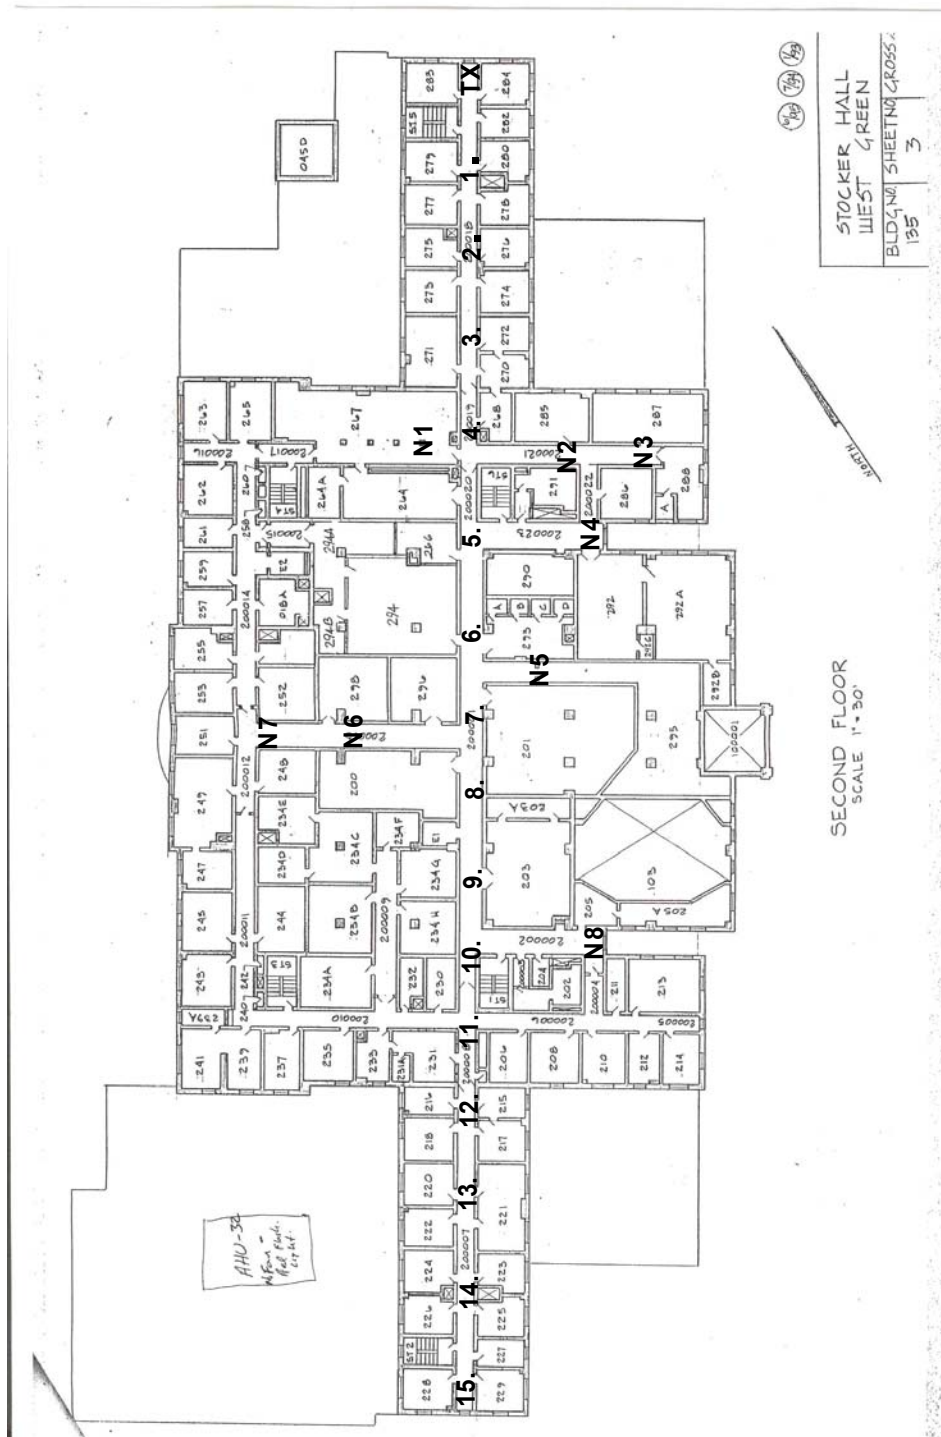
Layout of floor plan of second floor with transmitter and receiver locations
